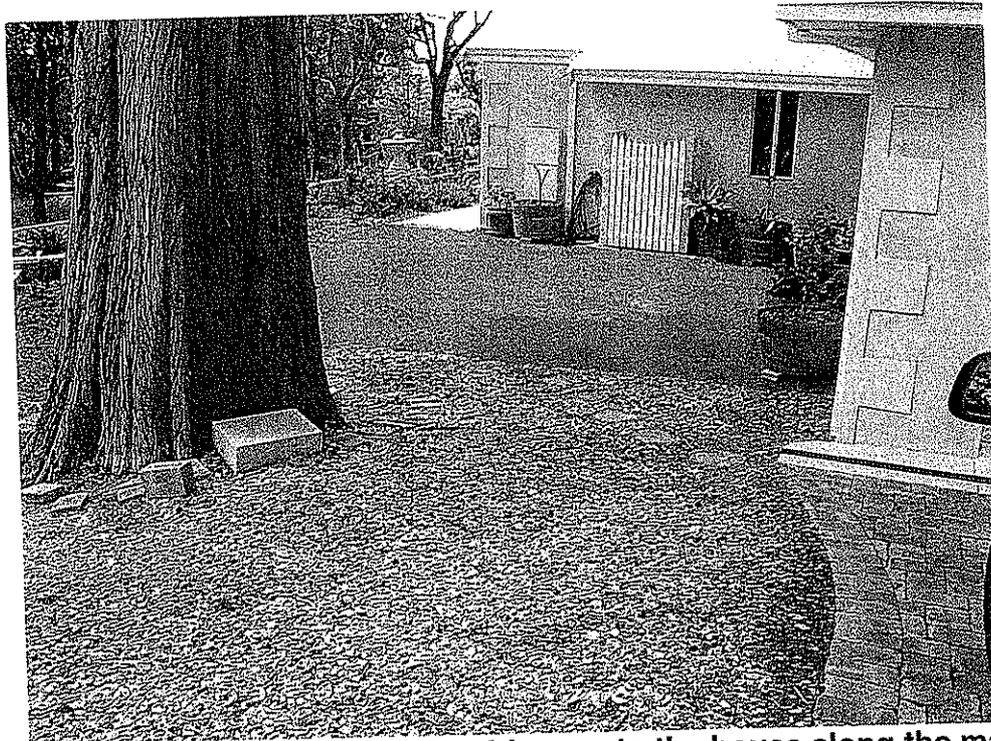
(Looking east from the driveway to the house along the main pedestrian route from car park to main entrance to the house)
